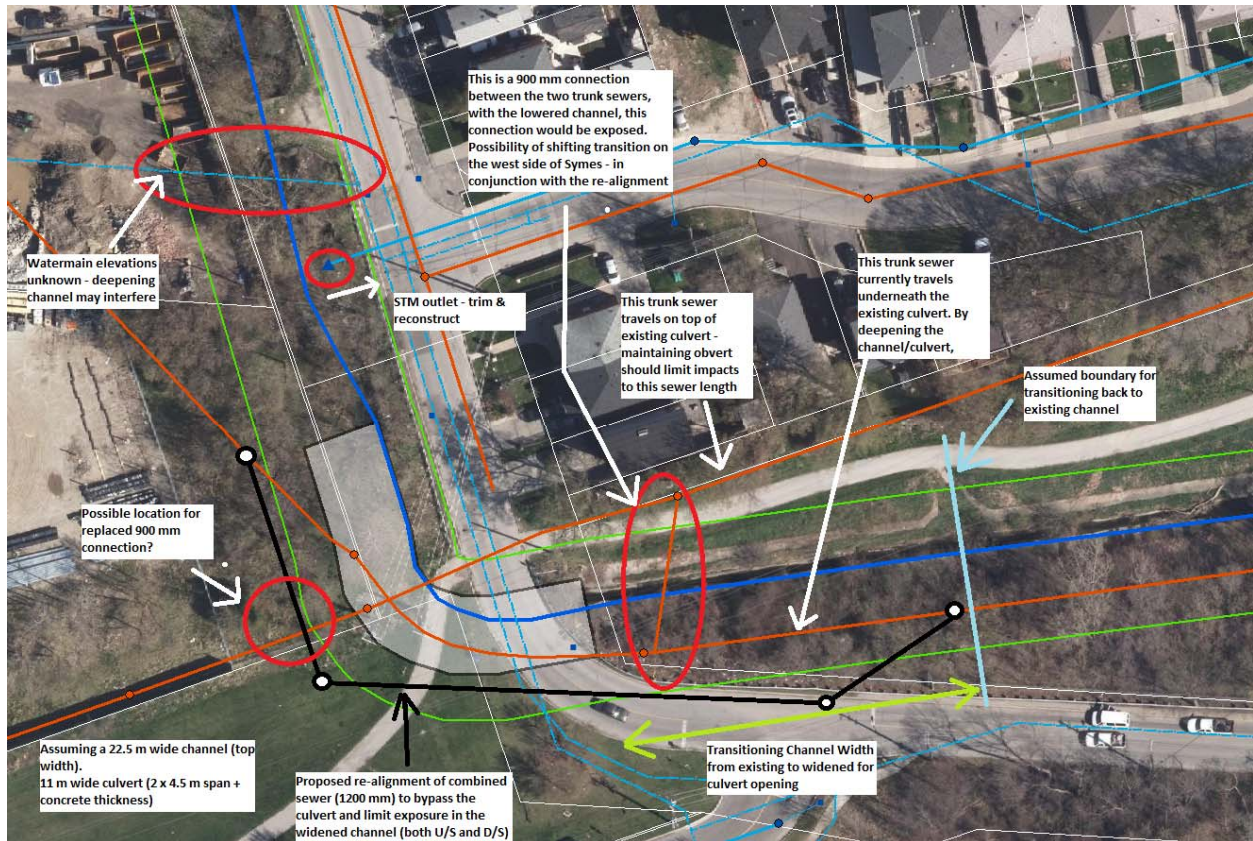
Infrastructure Considerations for Lavender Creek Channel Widening and Symes Road Culvert Upgrade
